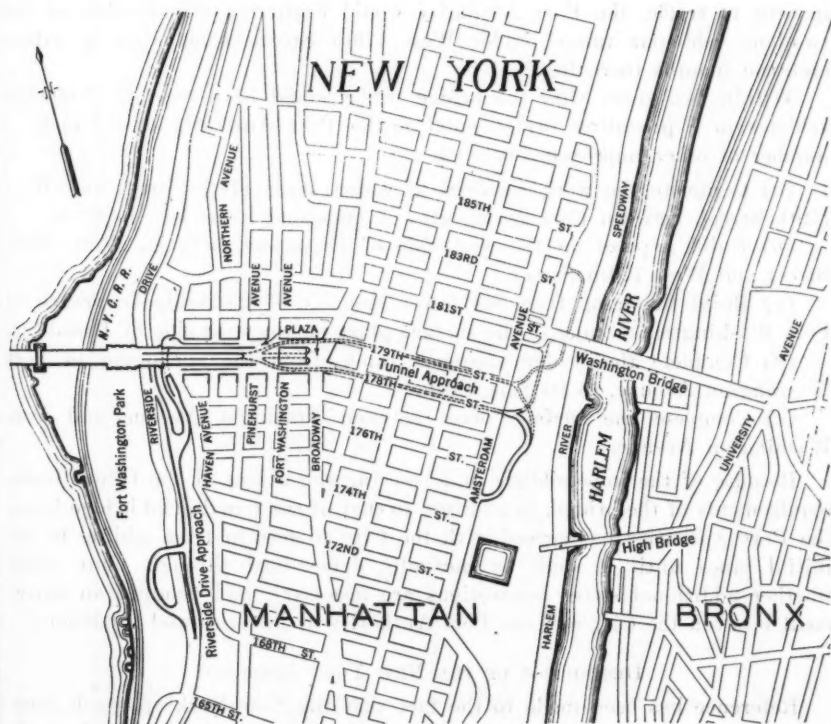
GENERAL PLAN OF NEW YORK APPROACH AND CONNECTIONS.
